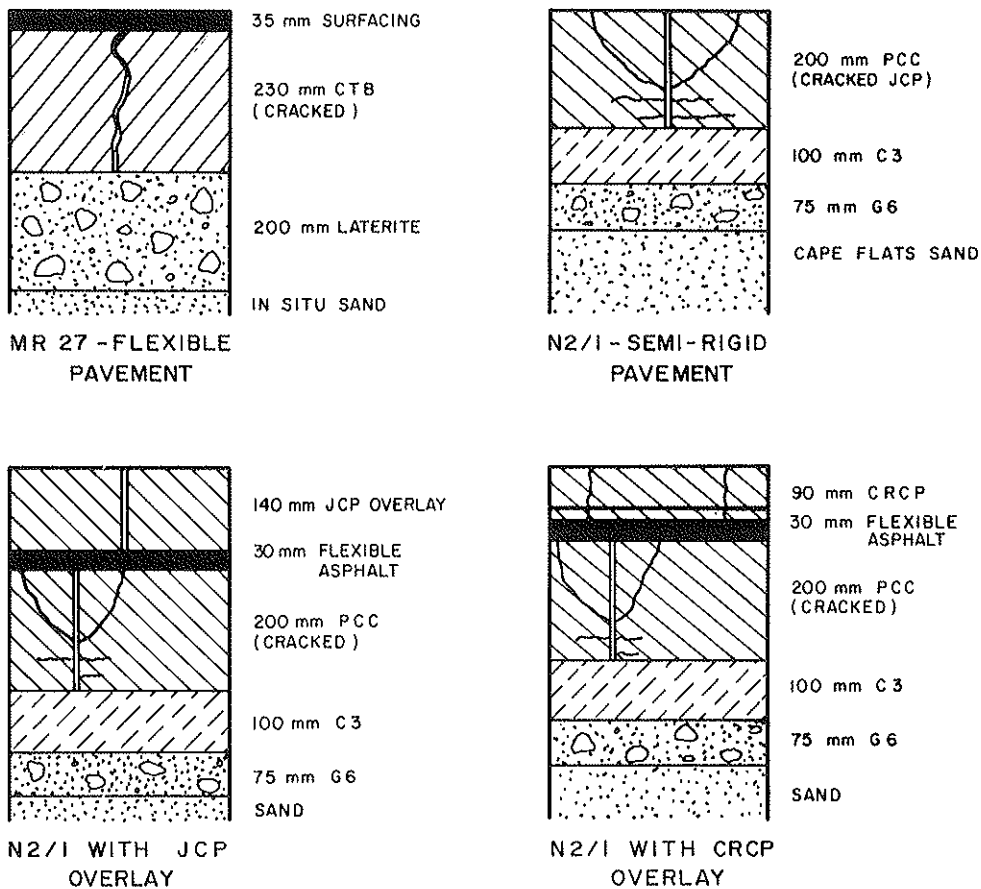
Structures of pavements on which crack movement behavior was determined.
